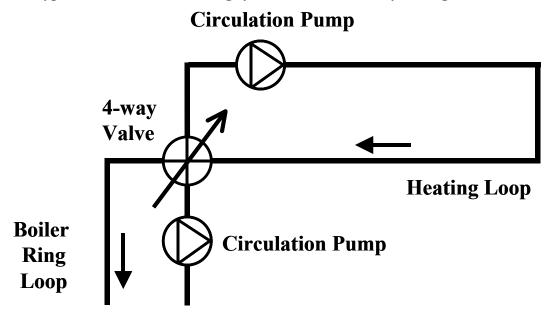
Typical installation of heating system with a four-way mixing valve. *HOT-AIR SYSTEMS
